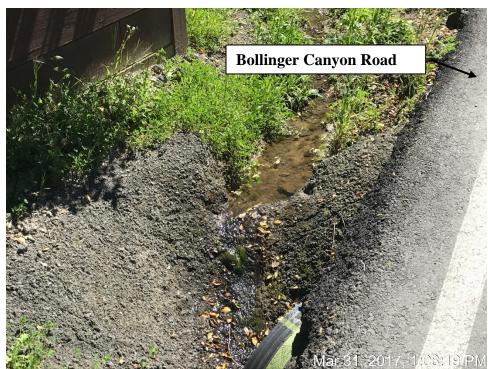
Tributary 1 Culvert Inlet Along Bollinger Canyon Road
